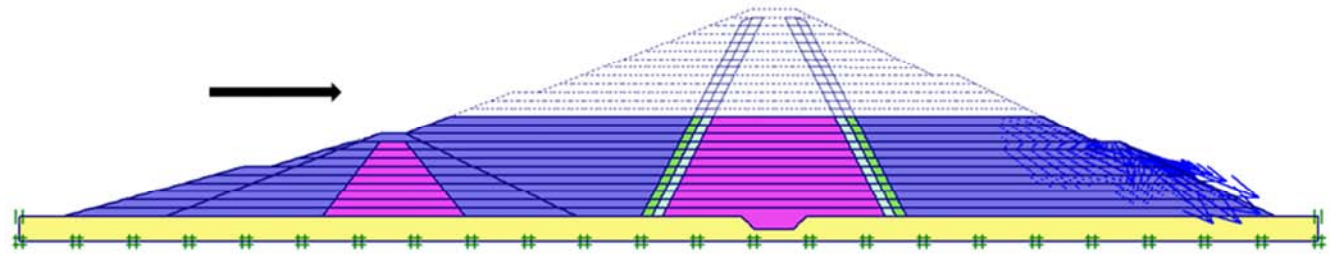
Possible failure surface of the Clay core embankment dam during construction (Source: Plaxis output).
